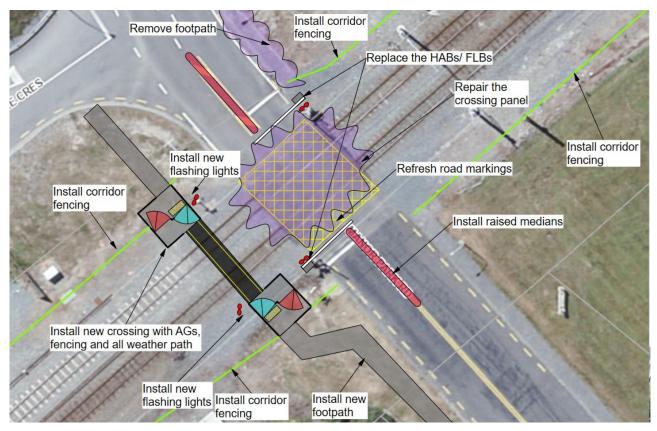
Recommendations for the Manor Park Road Level Crossing
